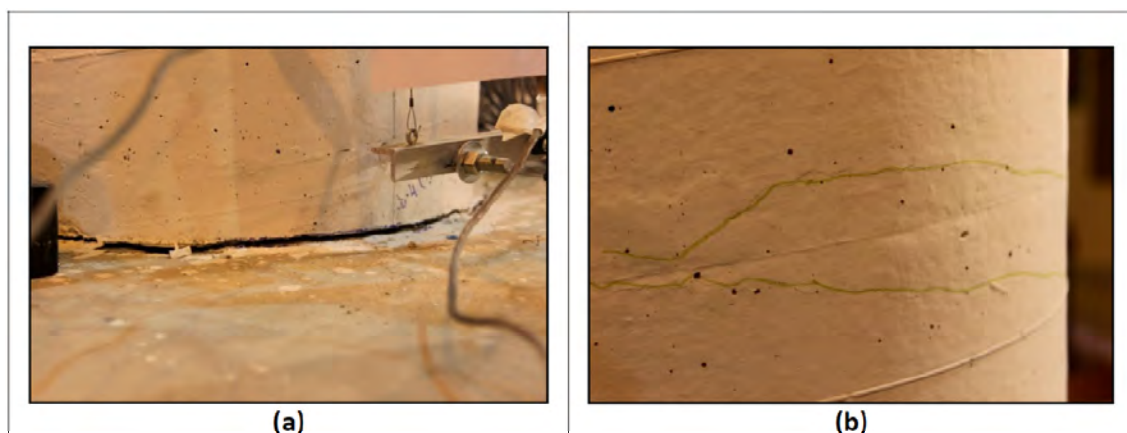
(a) Crack at column-foundation interface at $\theta_r = 1.2\%$; and (b) thin hairline flexural cracks at 22 in. and 24 in. above the foundation top at $\theta_r = 1.8\%$ on the east face of the column.
